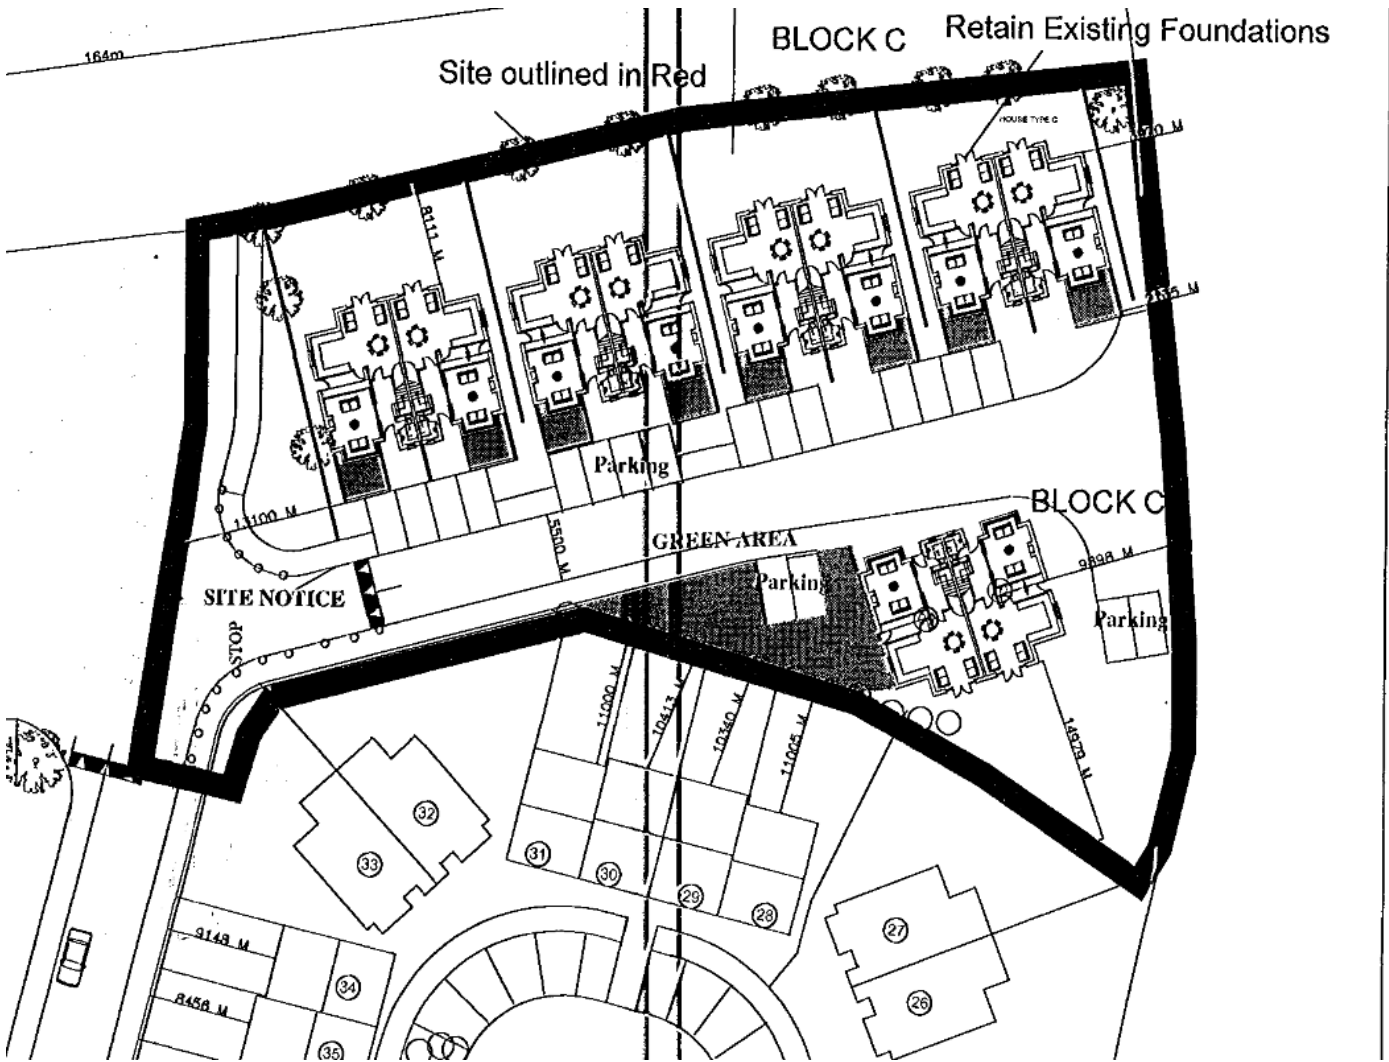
Extract of Site Location Plan Dwg. No. D1000-A031-A (Application Reg. Ref. 18221; ABP Ref. 3022939-18). Source: Kerry County Council online planning search tool.
